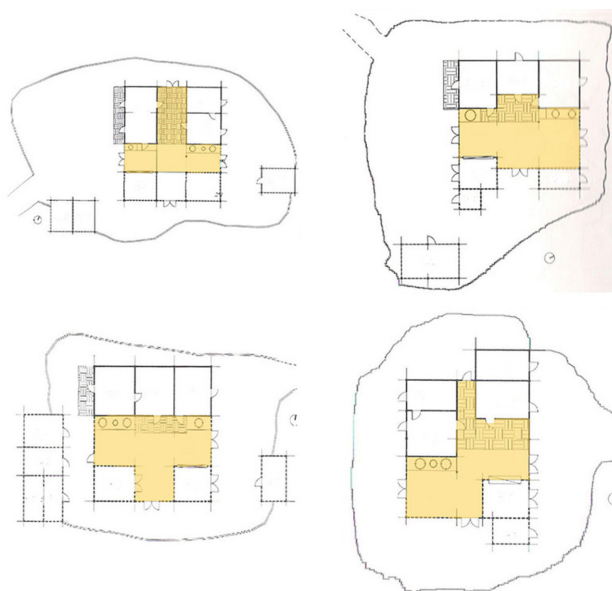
Various Floor Plans of Neowa Houses with Kitchen and Indoor Maru Space Indicated as Area High-lighted (Yim, 2011)
